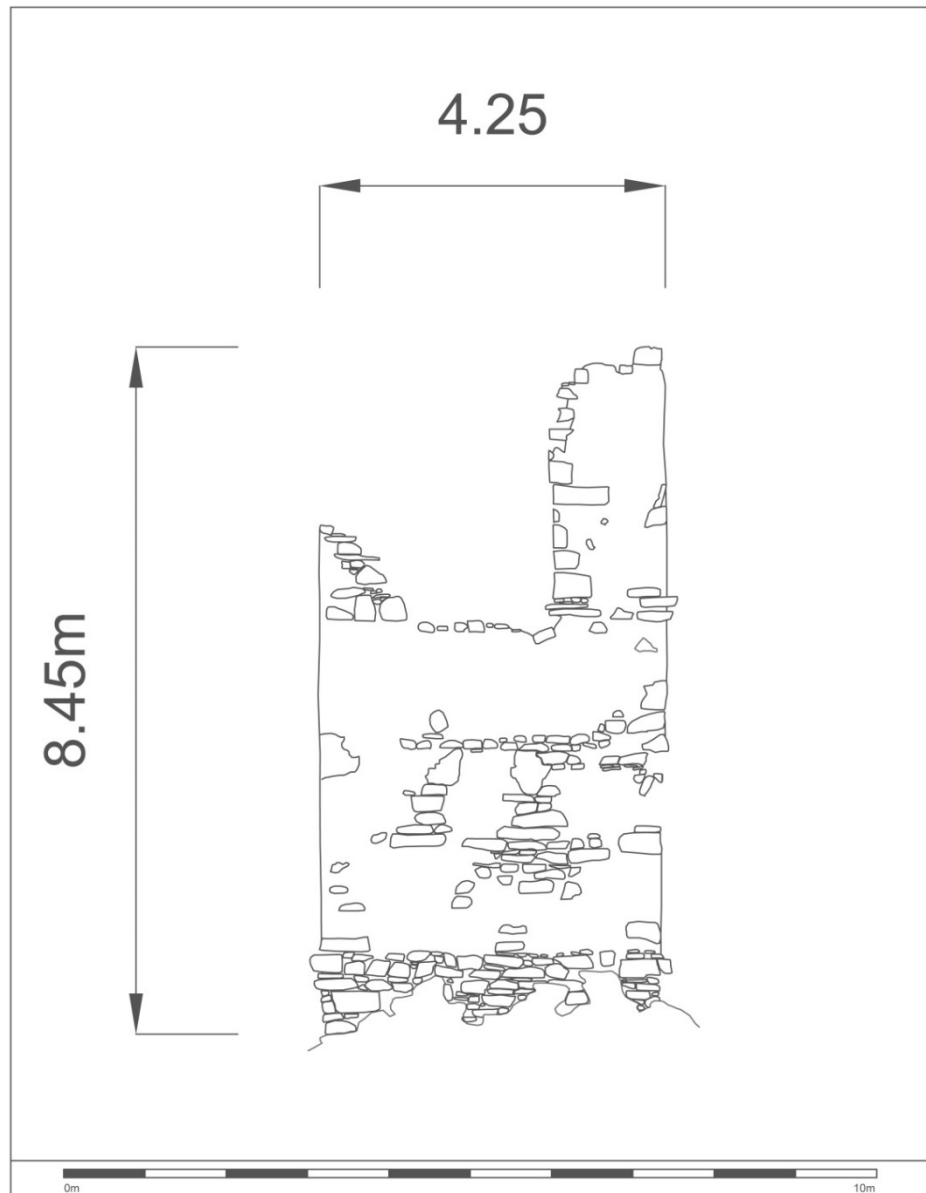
Internal elevation of the west wall of Clare Island Signal Tower.
